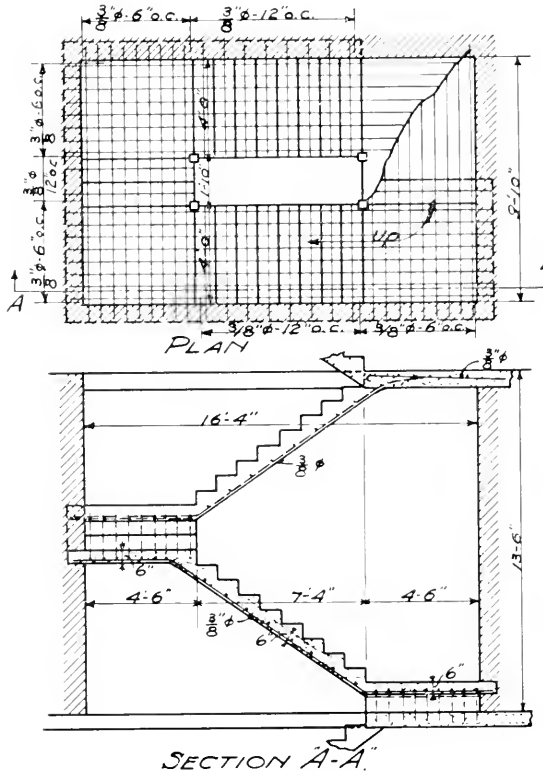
Typical Detail of Reinforcement Concrete Stairs
